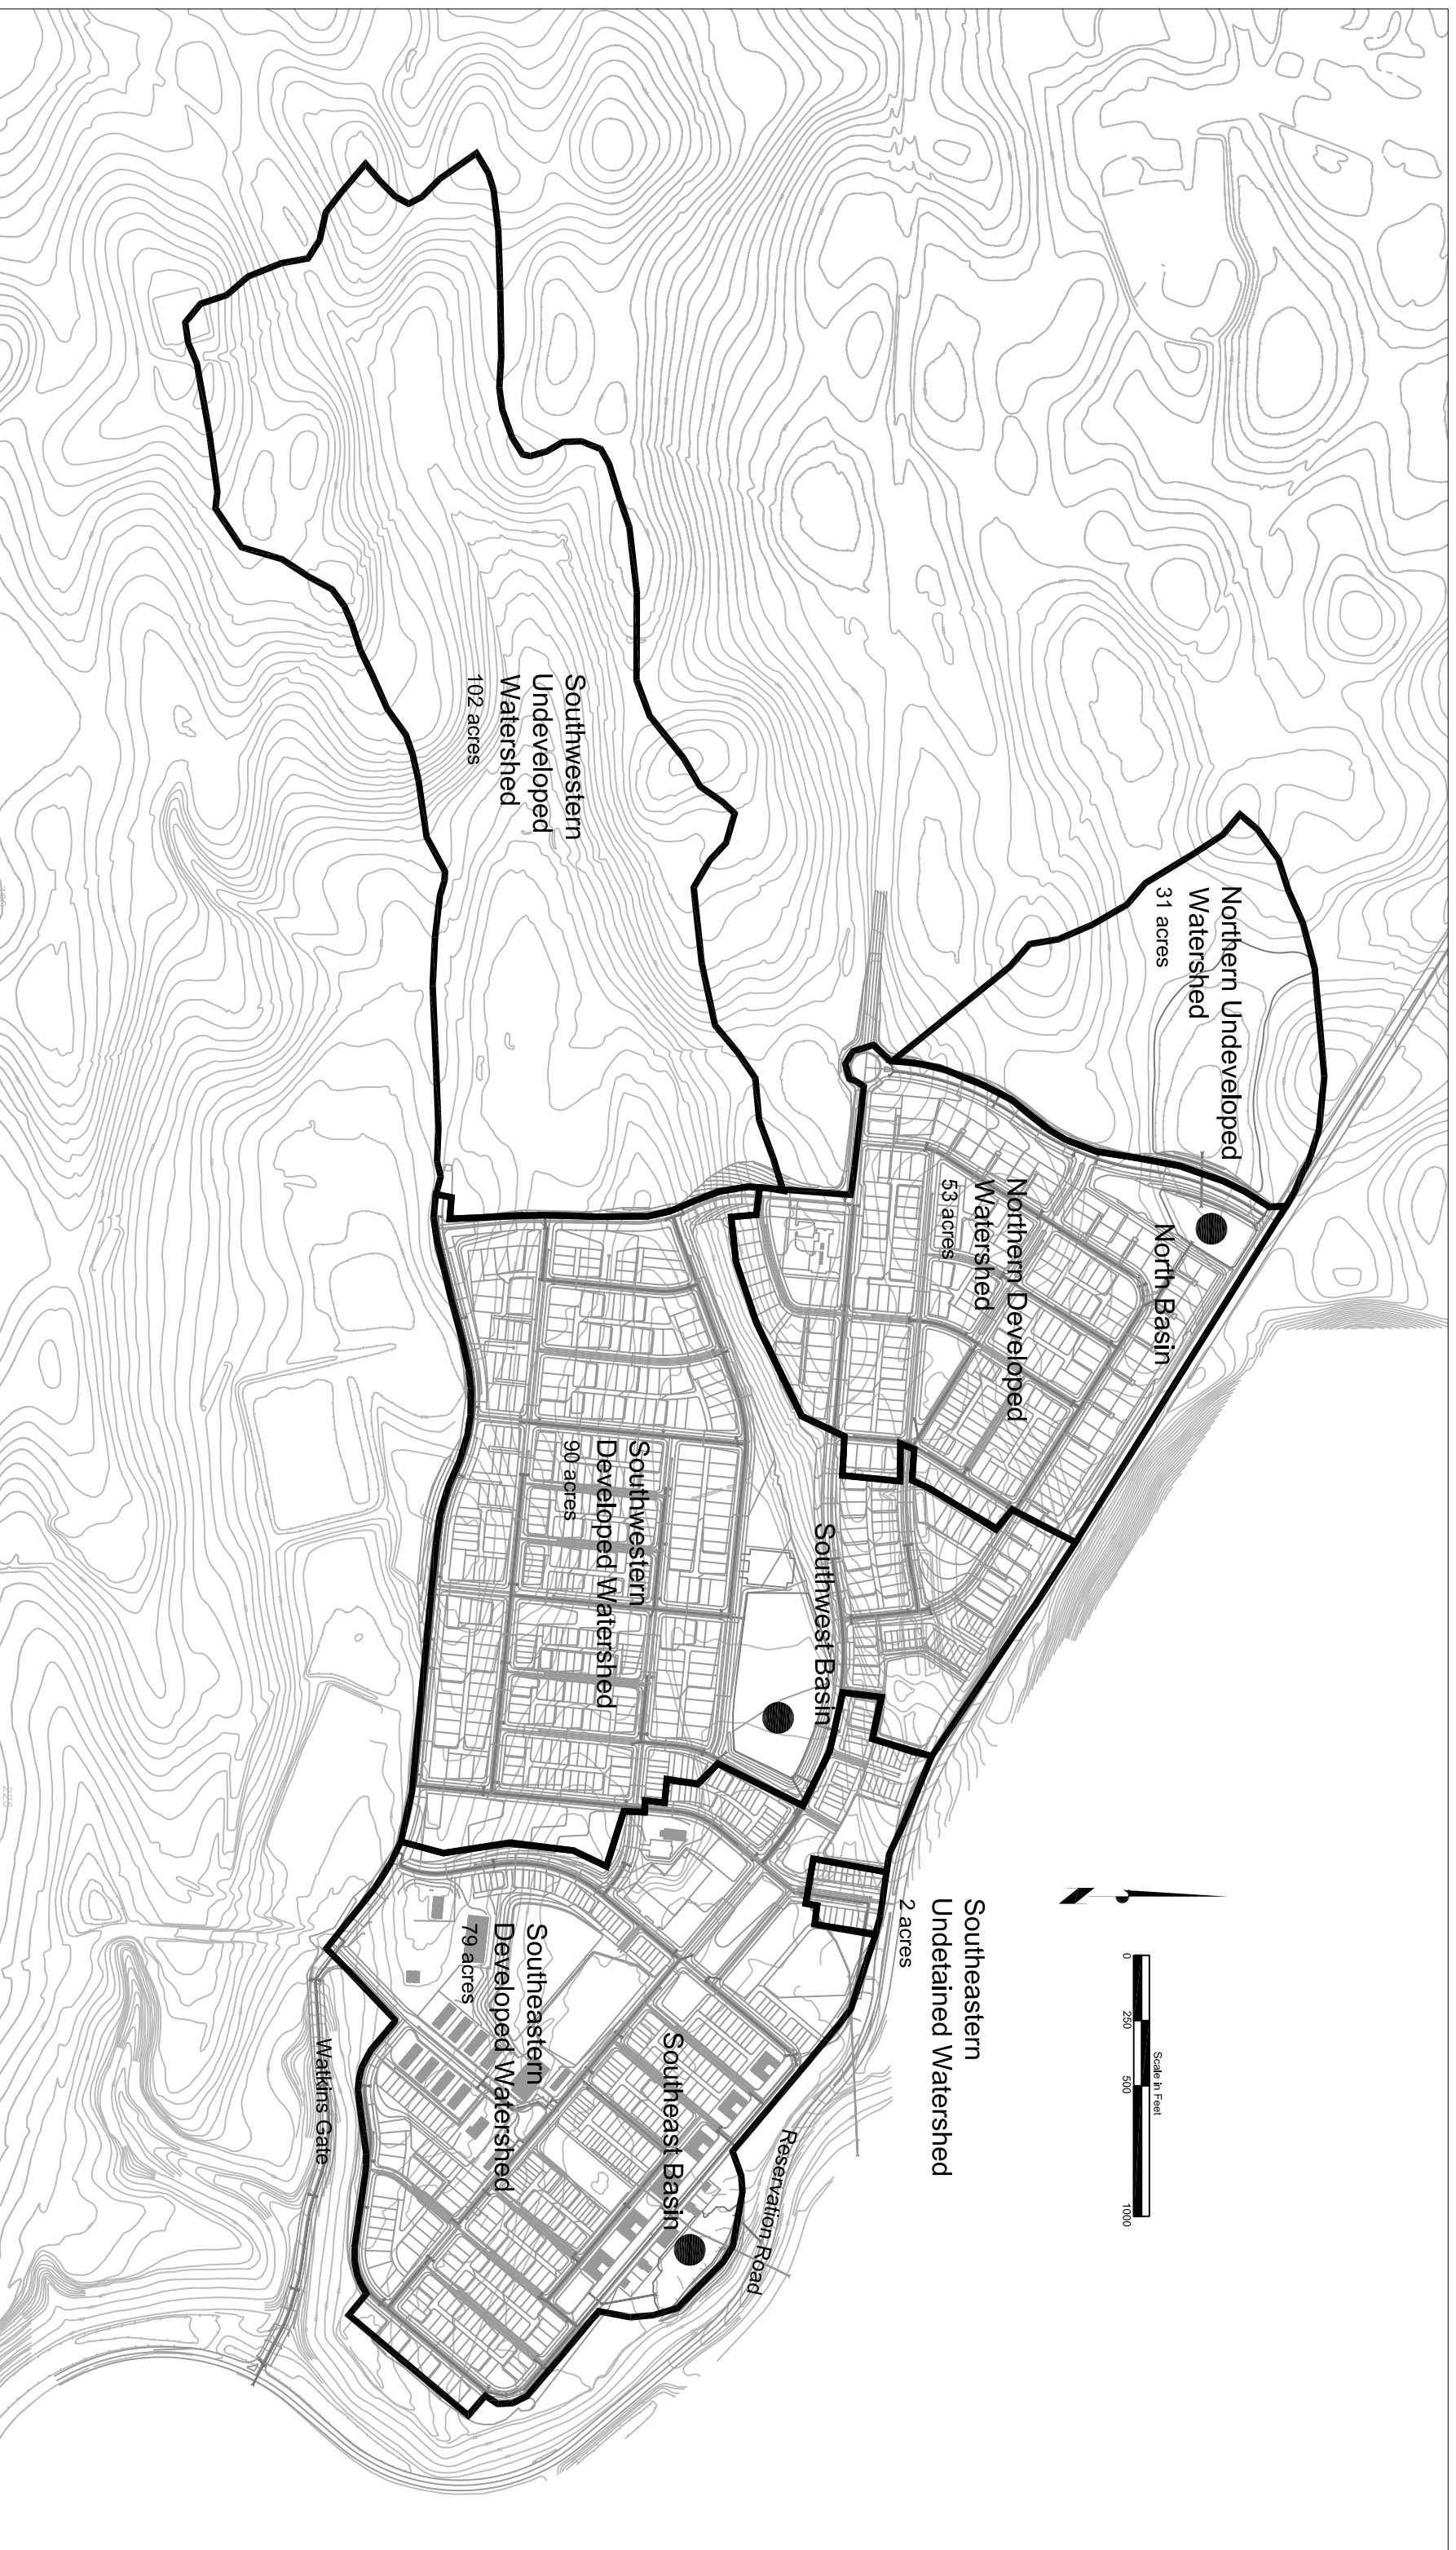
Post-project drainage areas, underground storm drain layout, and detention basin locations, East Garrison, County of Monterey
